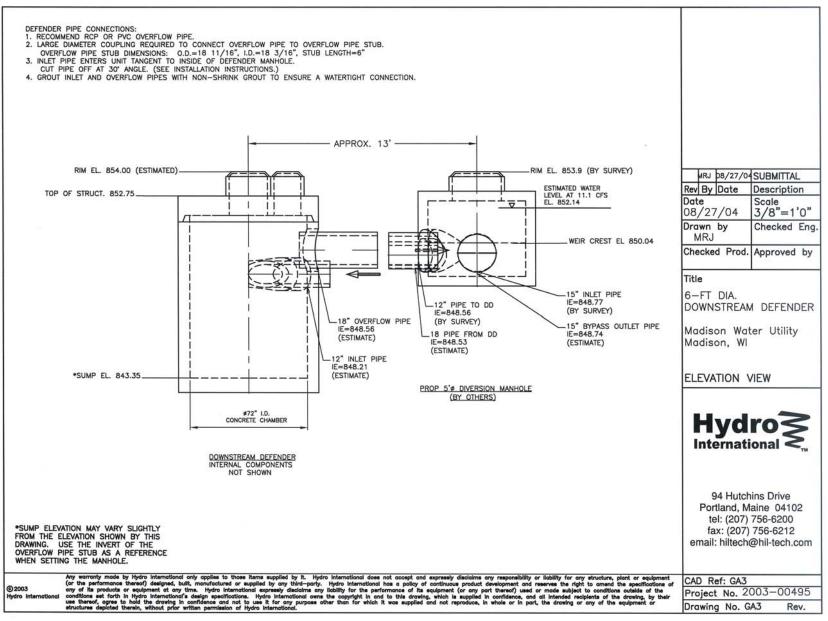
Elevation View of the Downstream Defender, Madison, WI
